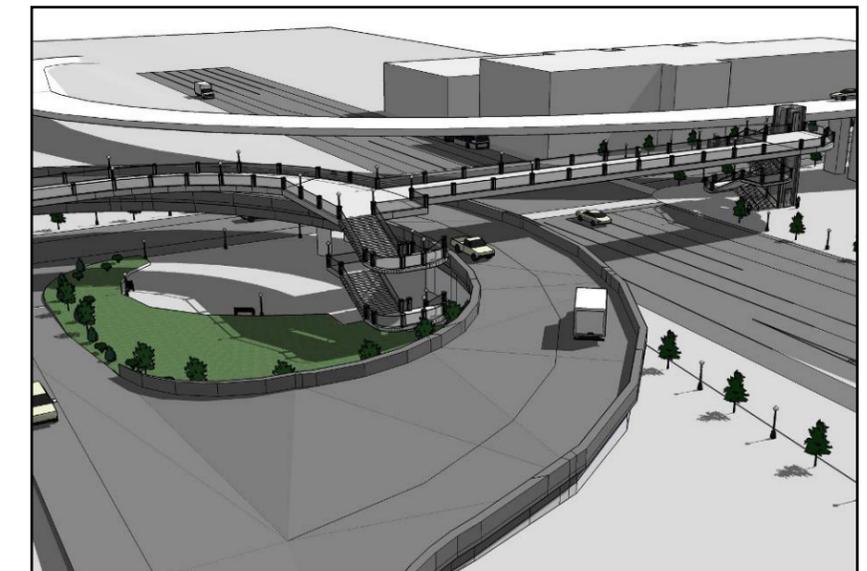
shows conceptually a circular ramp nesting within the Traffic Loop Ramp discussed above. This pedestrian ramp allows people to cross the railroad right-of-way above train traffic. It directs pedestrians to the southwest corner of the 4th Avenue South and South Royal Brougham Way intersection, complies with ADA criteria, and accommodates bicycle traffic as well.
